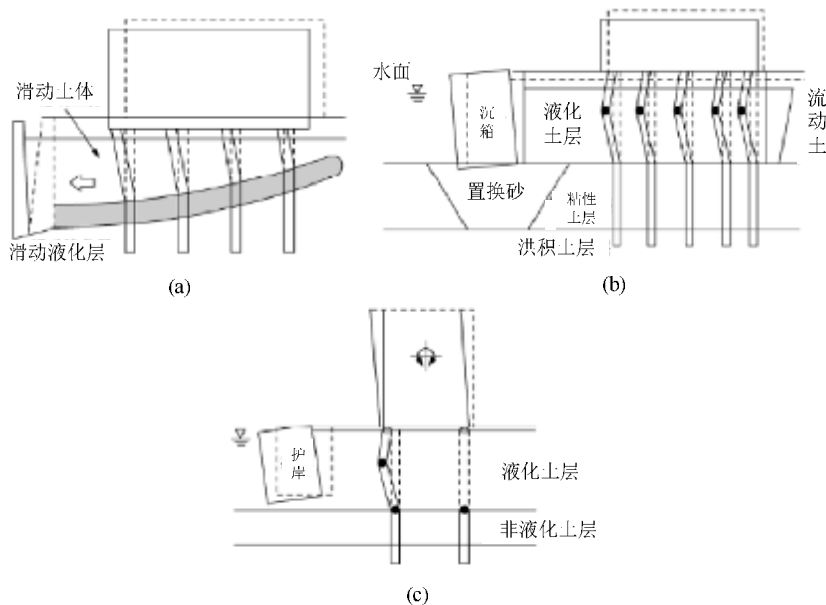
Seismic damage model of pile foundation on liquefied laterally expanded foundation
